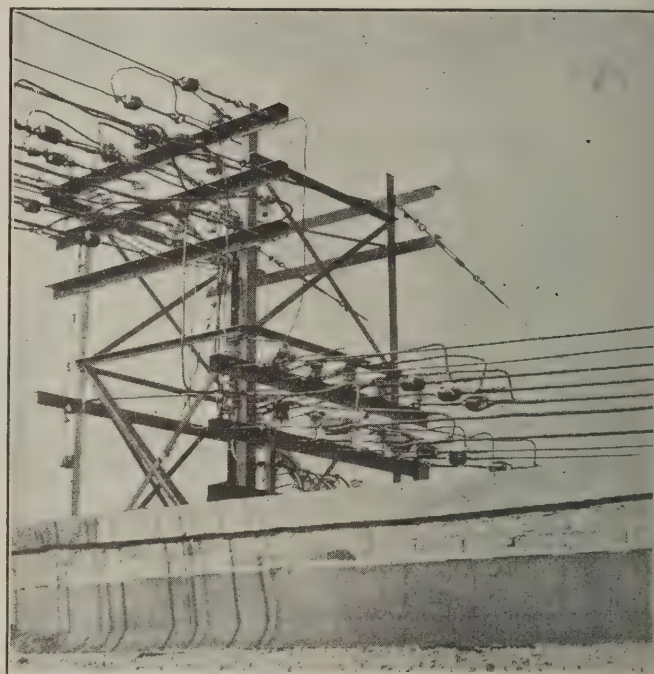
Another View Showing Partly Completed Cable Work on Corner Tower "C"
